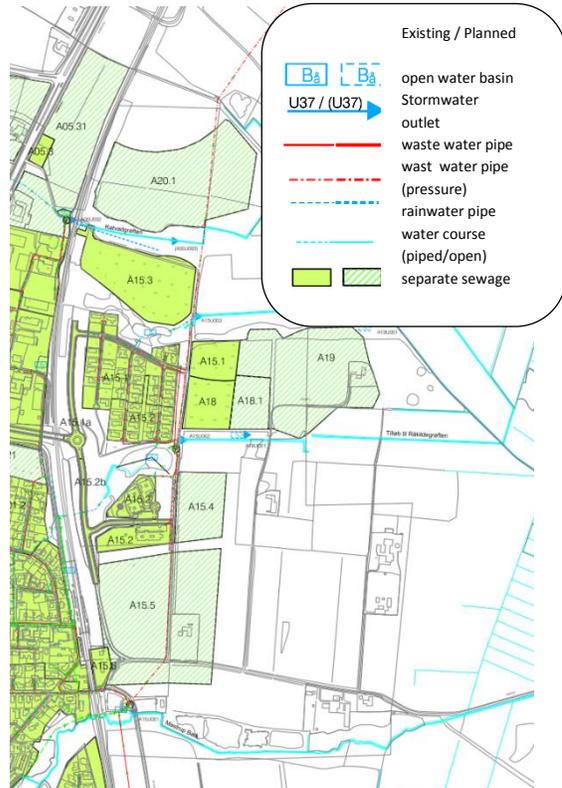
Sewage Plan Støvring Ådale (Rebild Kommune 2015)
